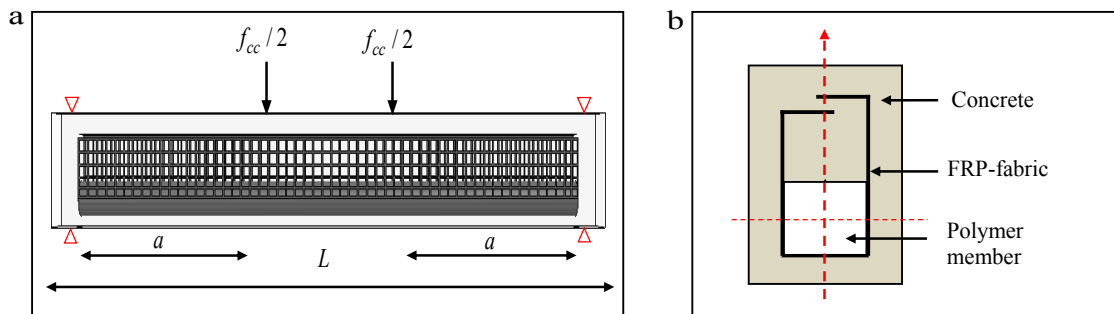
(a) Proposed concrete-based beams with Polymer/FRP components; (b) Transversal view of the beam.
